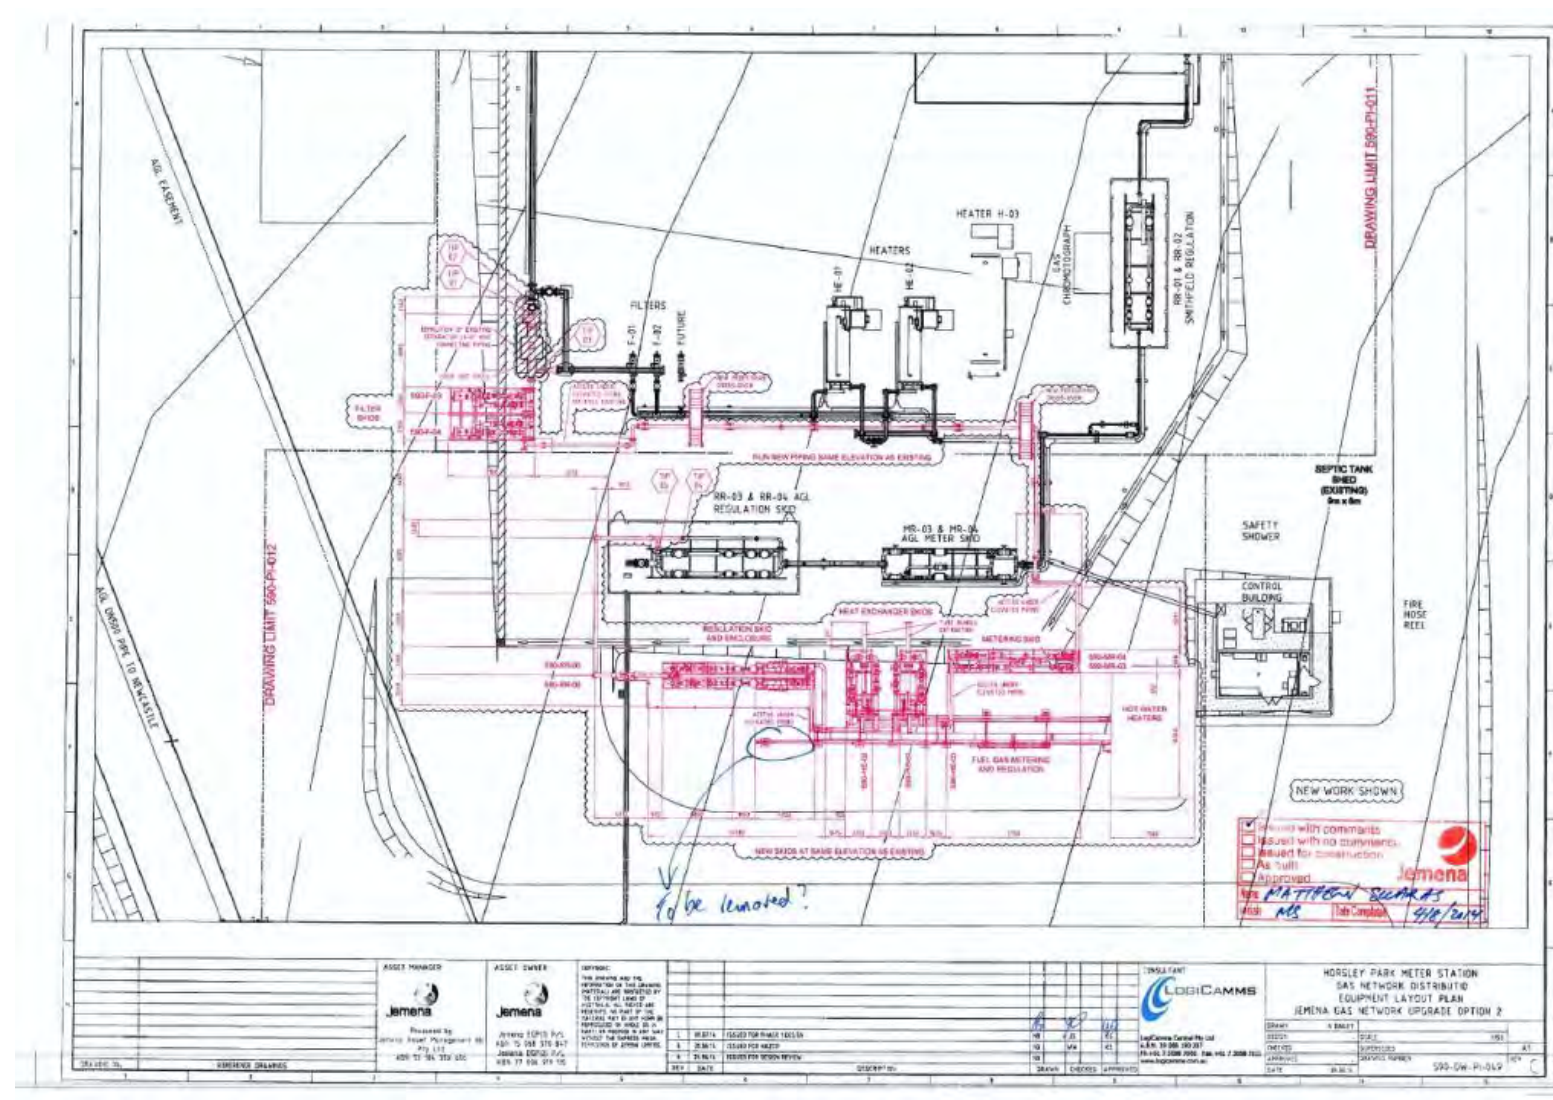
has been provided to show an aerial photograph of the existing natural gas facility in which the proposed gas-fired boiler would be installed, while Figure 2-2 shows the site layout of the new infrastructure proposed within the existing facility, including the gas-fired boiler.
